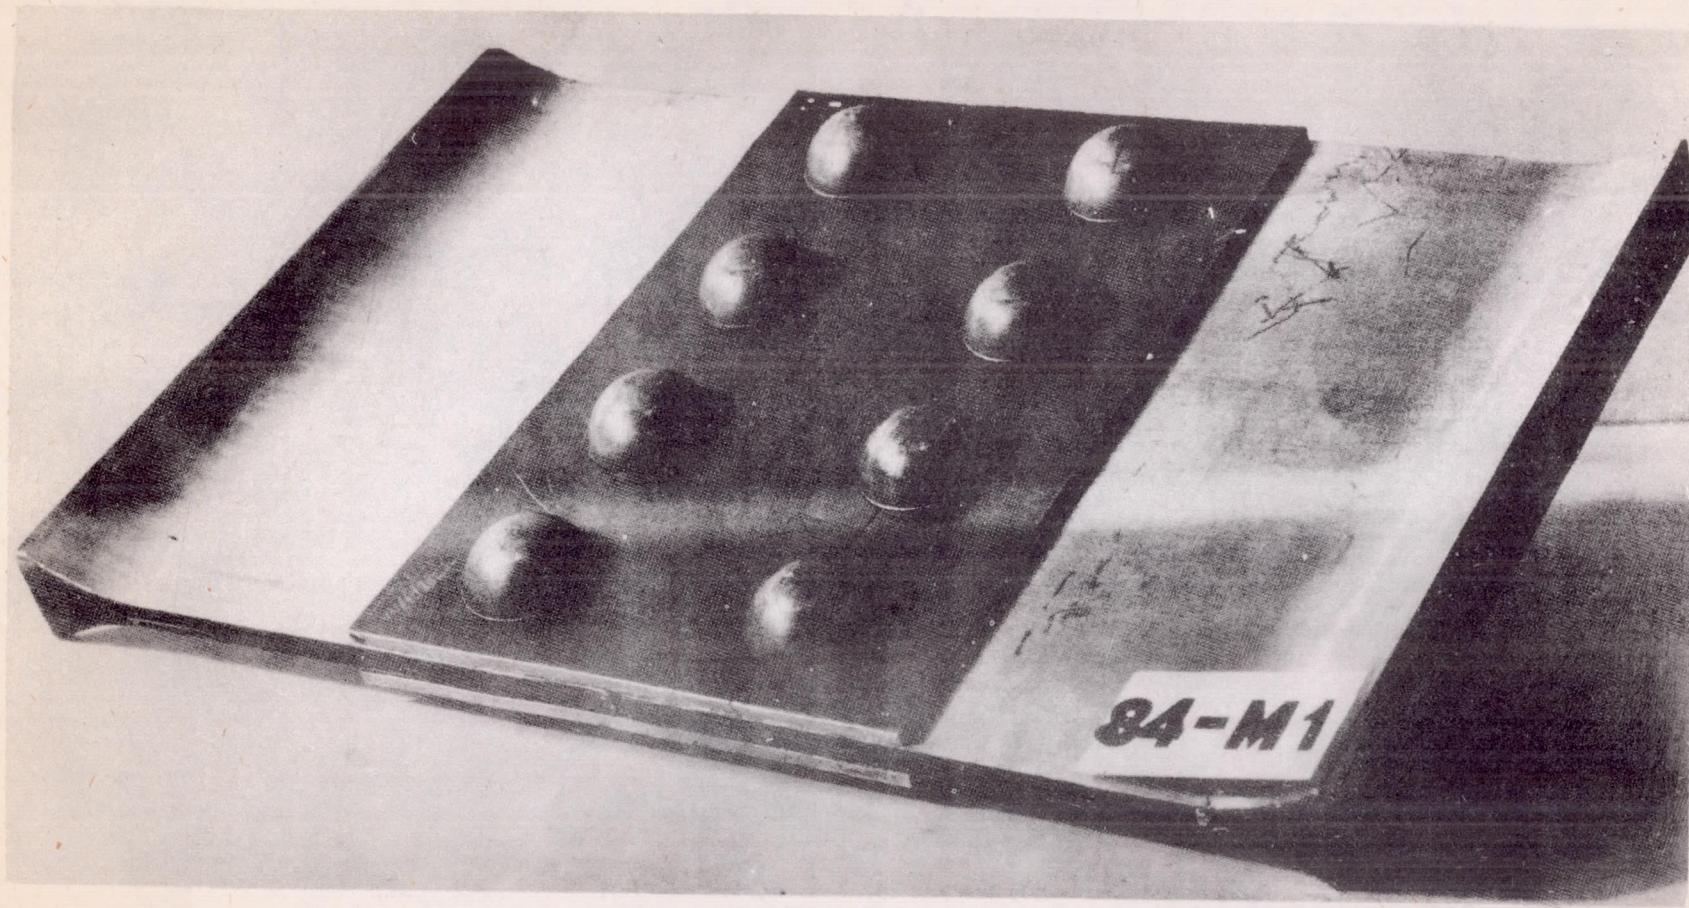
Typical fracture of type M specimen with failure in cover plate.
